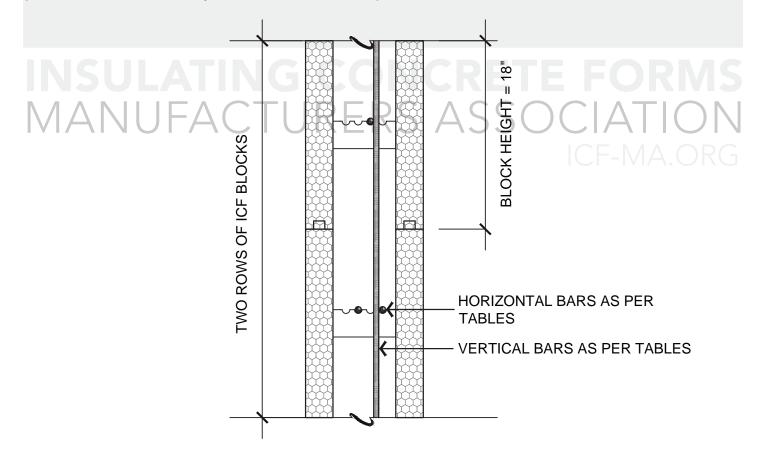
Above Grade Wall Reinforcing Placement for 6", 8" and 10" Thick Walls.
